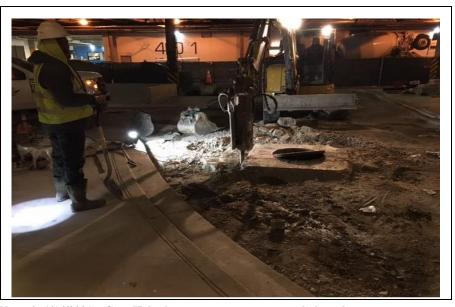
1/14/2021 – Core Holes in extra concrete near manhole pad
